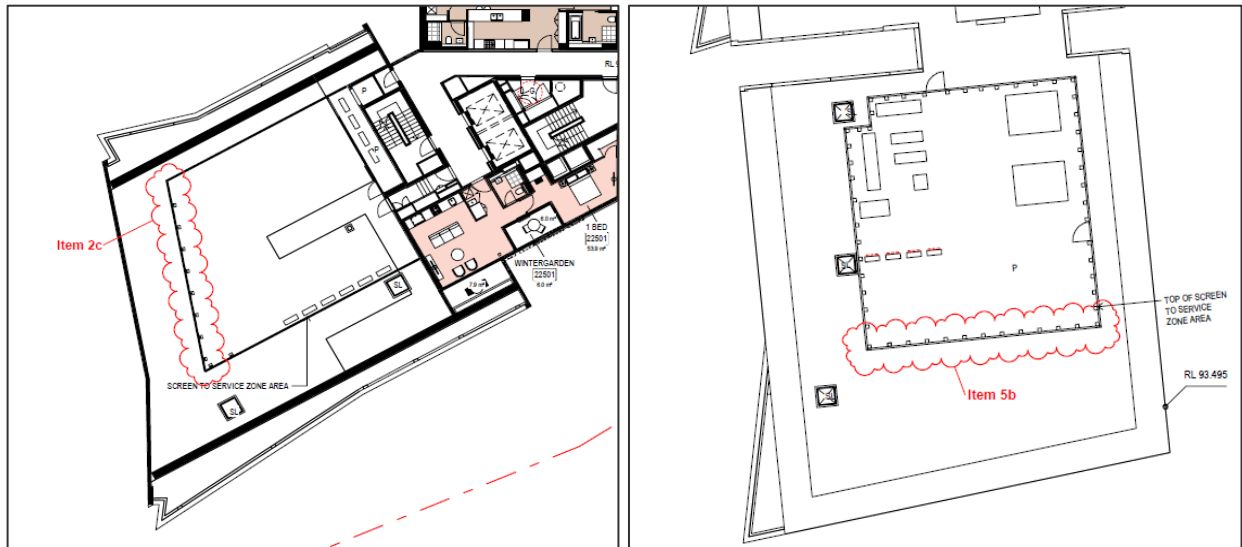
| Proposed increase of roof plant area on Level 25 Building 2 (left) (Item 2c) and reduction to roof plant area on Level 24 of Building 5 (right) (Item 5b) (Source: Applicant)
